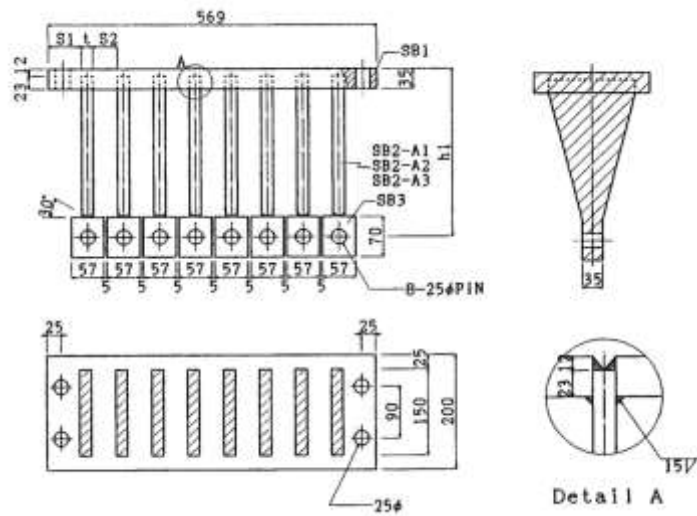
Details of steel welded TADAS device (units: mm)-(Tsai, Chen [1])
